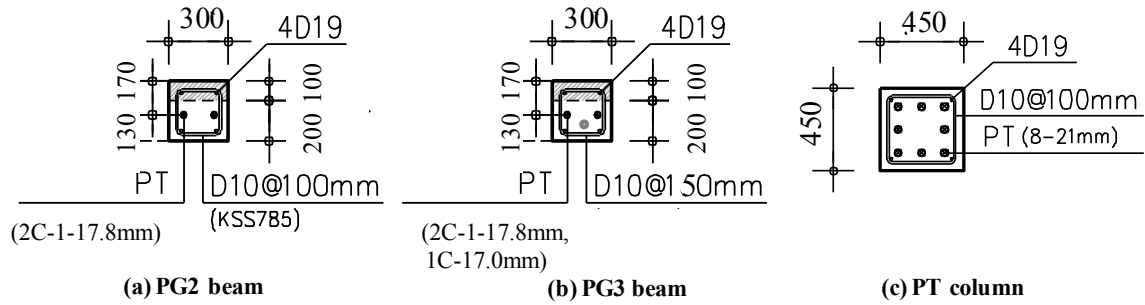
Cross sections of y-direction UPT beams (a), (b) and PT column (c) (dimensions in mm)
